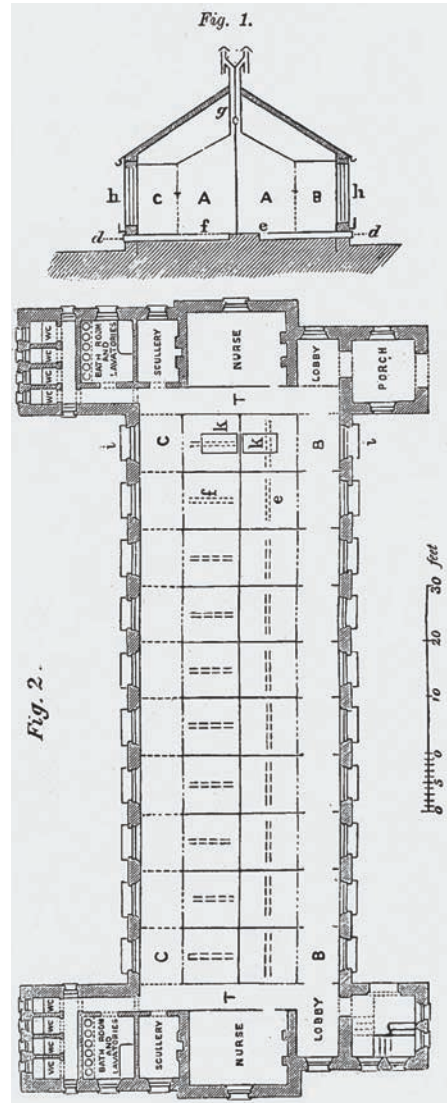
Isolation Ward, Henry Greenaway, 1875. The section shows the underfloor supply ducts to the individual cubicles and the individual exhaust ducts from the ceiling. The shared bathrooms and common sculleries reveal the minimal concern about daily physical objects (plates, utensils, linens) as carriers of disease.
